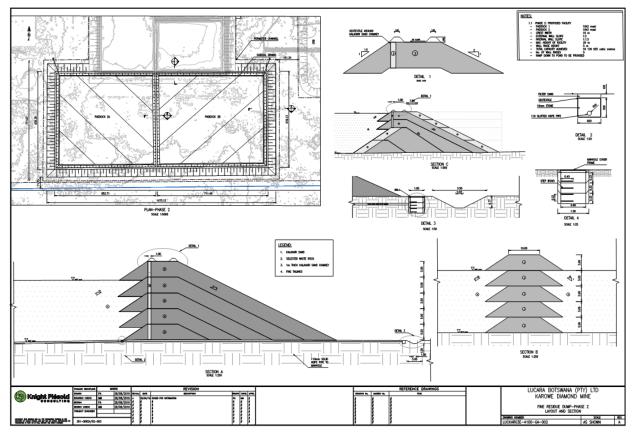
Fine Residue Dump - Phase 1 Layout and Section
